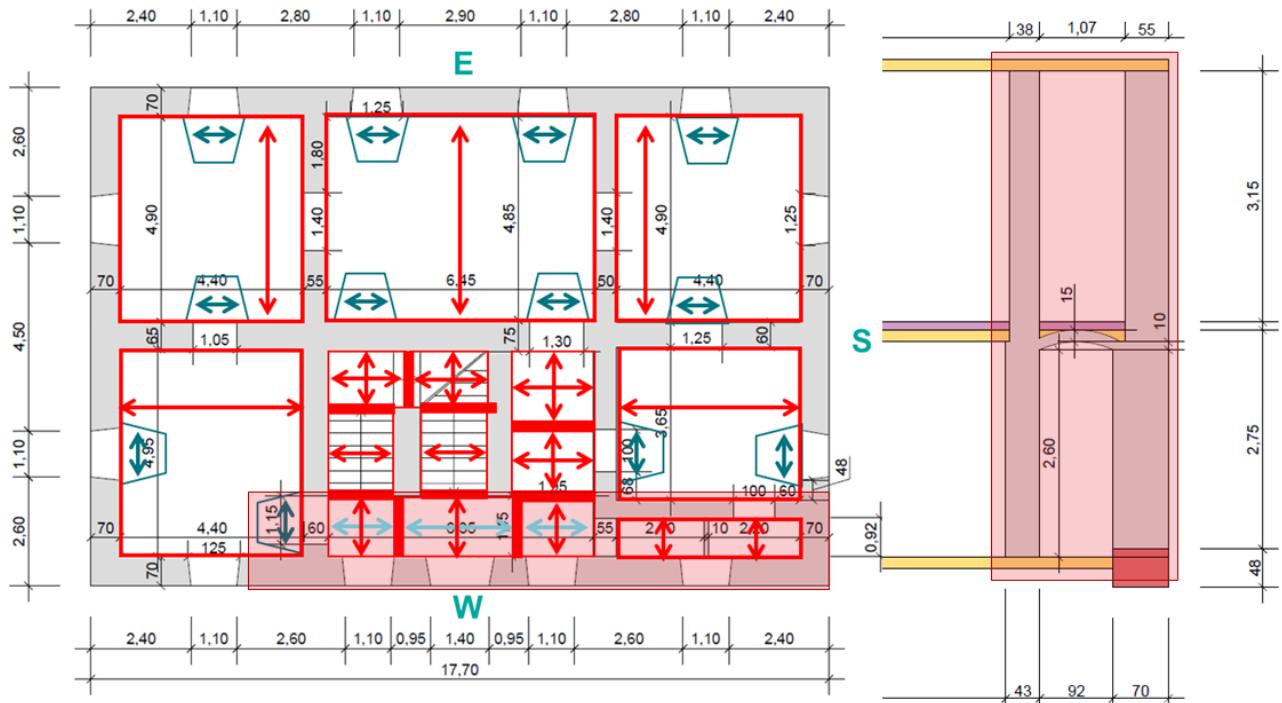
OOP mechanism west facade: Plan view and cross-section of the concerned zone
